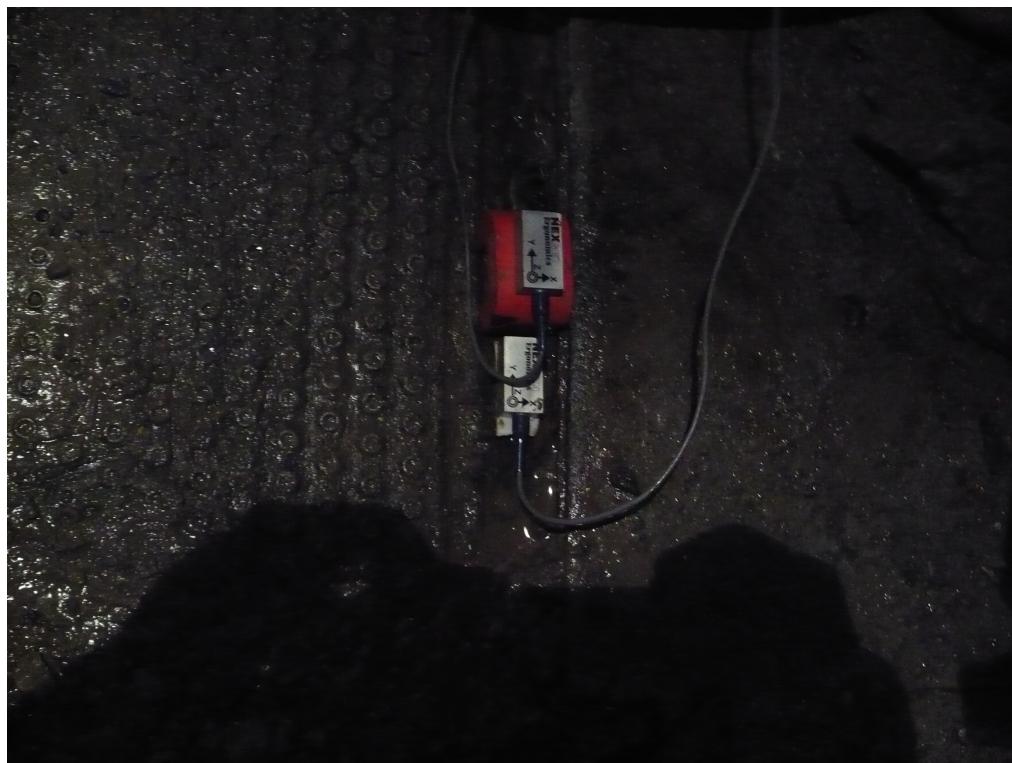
Accelerometer set-up for Bolter Drill 8 – Boart.
